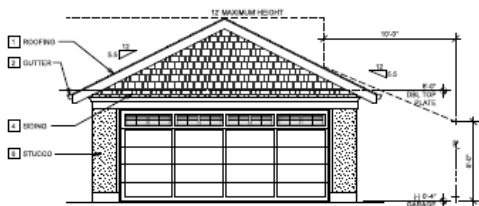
B 236 Eleanor Avenue- Rehabilitation Plan
